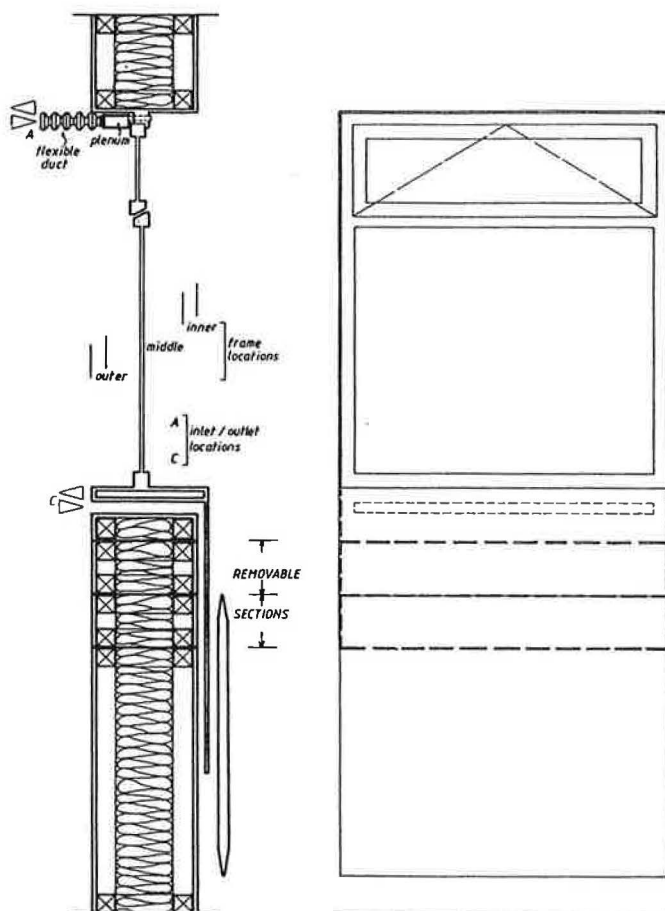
Section through separating wall showing window for single-glazed and double-glazed window tests
